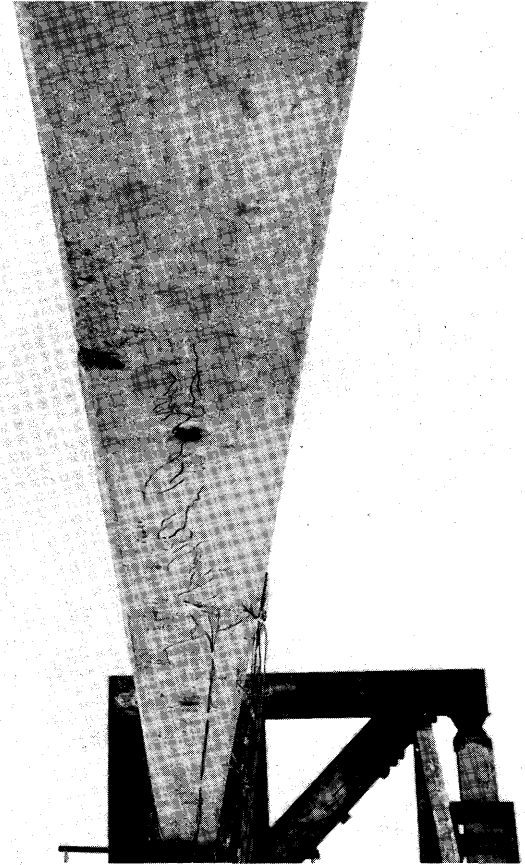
Photo of failure crack in lightweight girder.
